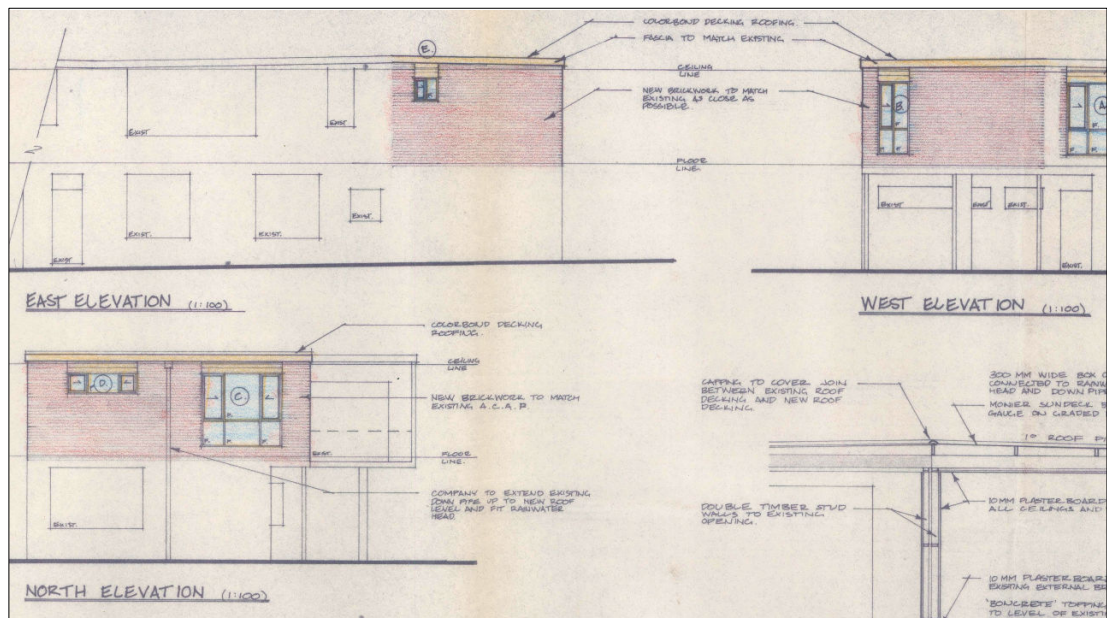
Extract from the 1988 plans showing a first floor addition to the 1975 rear addition. Source: City of Stonnington.
